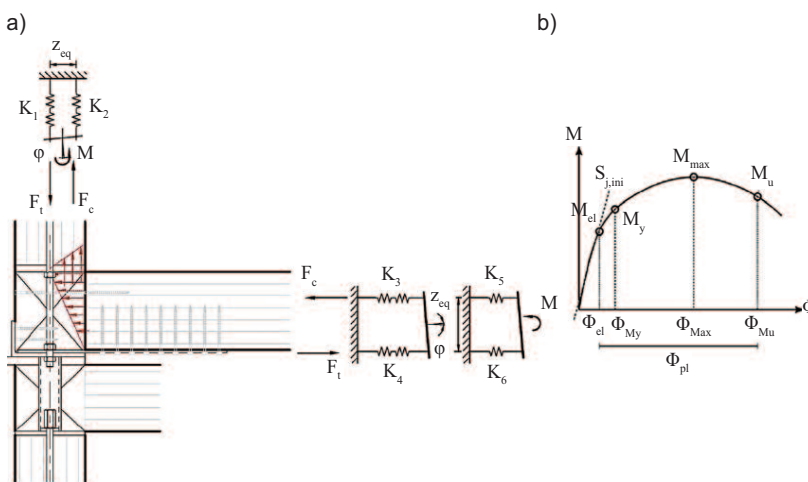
Connection between the floor slab and the wall: a) model of the connection using dowels between the floor slab and the wall; b) moment-rotation relationship graph for the floor slab-to-wall connection [4]
